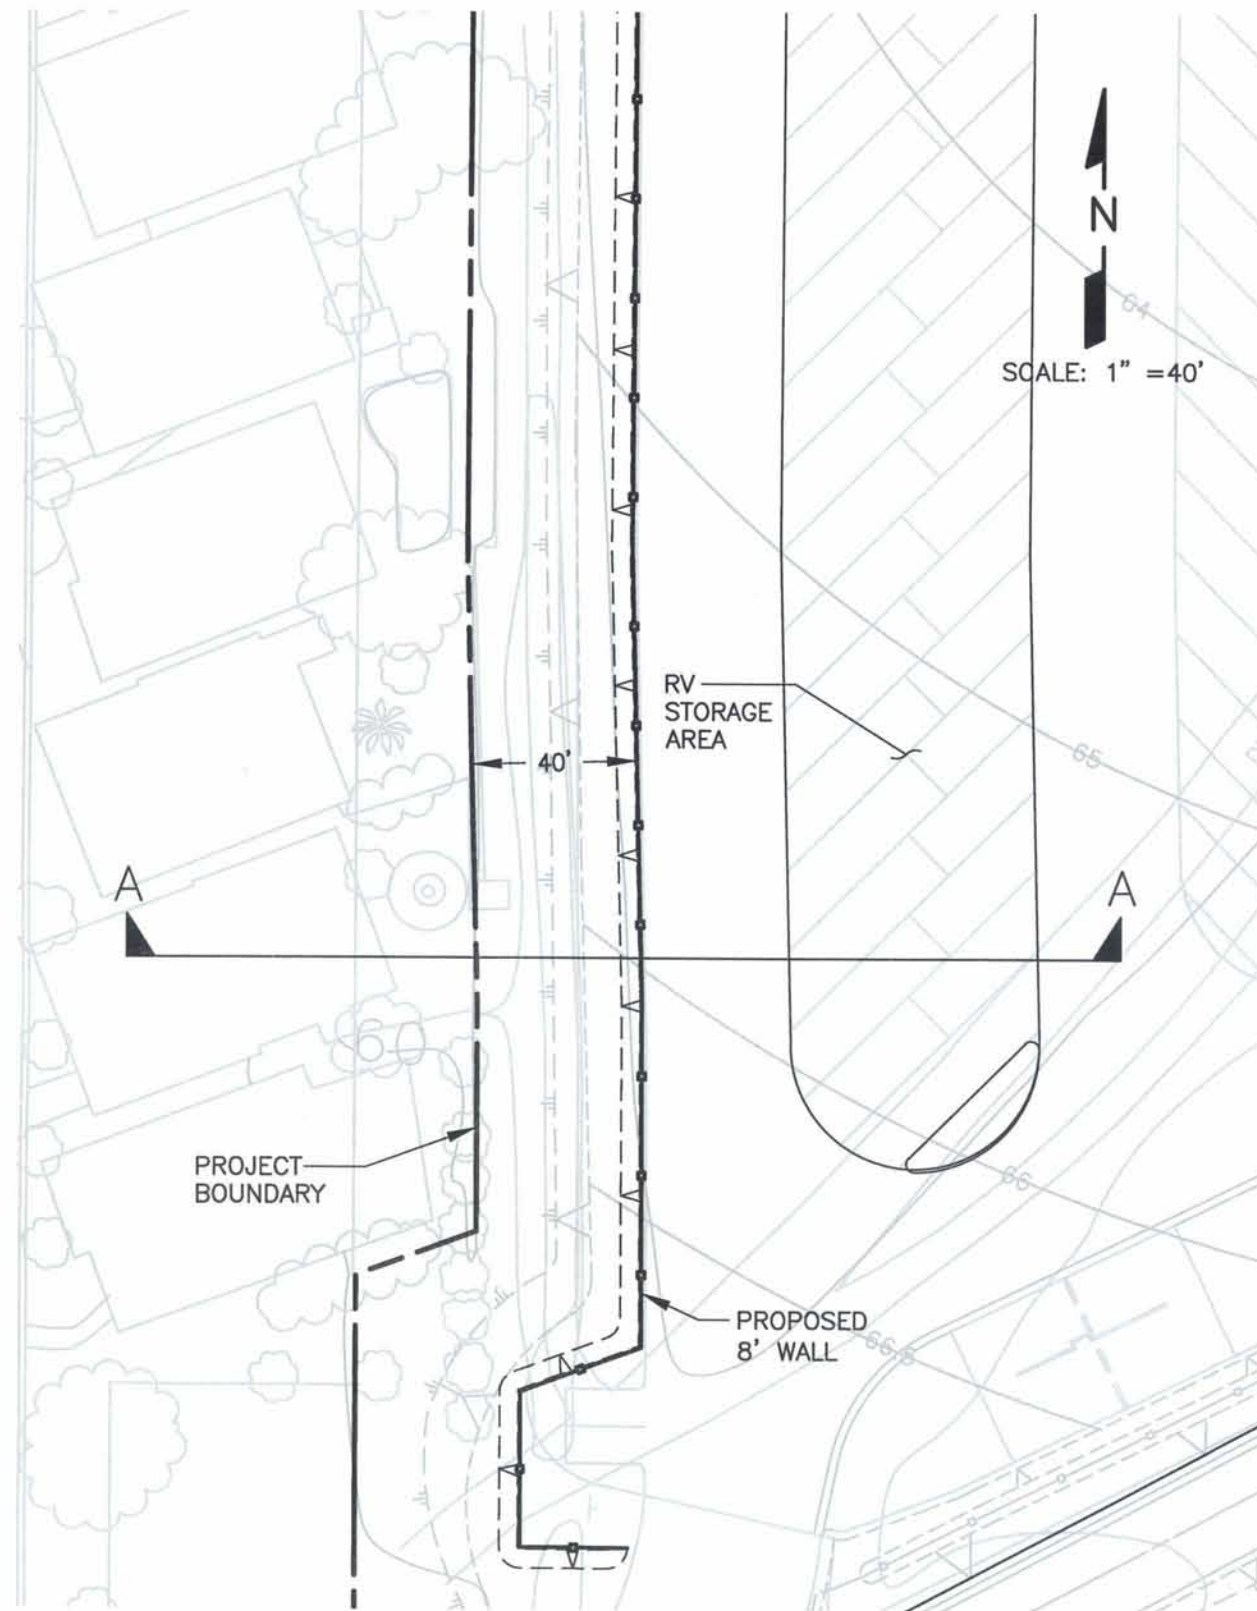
depicts the elevation cross sections of the proposed RV storage area. Grading for the RV storage site will result in an asphalt parking lot for the RVs that is located approximately 6-7 feet above the finished surface elevation of Don Alberto Drive, the first roadway located west of the RV storage site. An 8-foot-high concrete block perimeter wall, which would include a 2-foot-high landscape berm at the foot of the wall, is proposed along the perimeter of the RV storage area. The 8-foot-high concrete block perimeter wall would be located approximately 60 feet east of the existing residences at Rancho Carlsbad Estates. The nearest RV stored on the site would be approximately 100 feet from the existing residences. As shown in Figure 5.11-14, someone viewing the project site from an eye level would be able to see the proposed 40-foot-wide landscaping buffer, 8-foot-high concrete wall, as well as the top 1-2 feet of the nearest RV that would be stored on the site. As shown in this cross section and Figure 5.11-7 (View 1), the view from this location would change from a view with a large depth of field containing grassland and rolling hills, to a view with a shallow depth of field containing a landscaped buffer and an 8-foot-high concrete block wall. Therefore, the proposed project would affect existing views of grassland and the surrounding rolling hills to residents of Rancho Carlsbad Estates.
